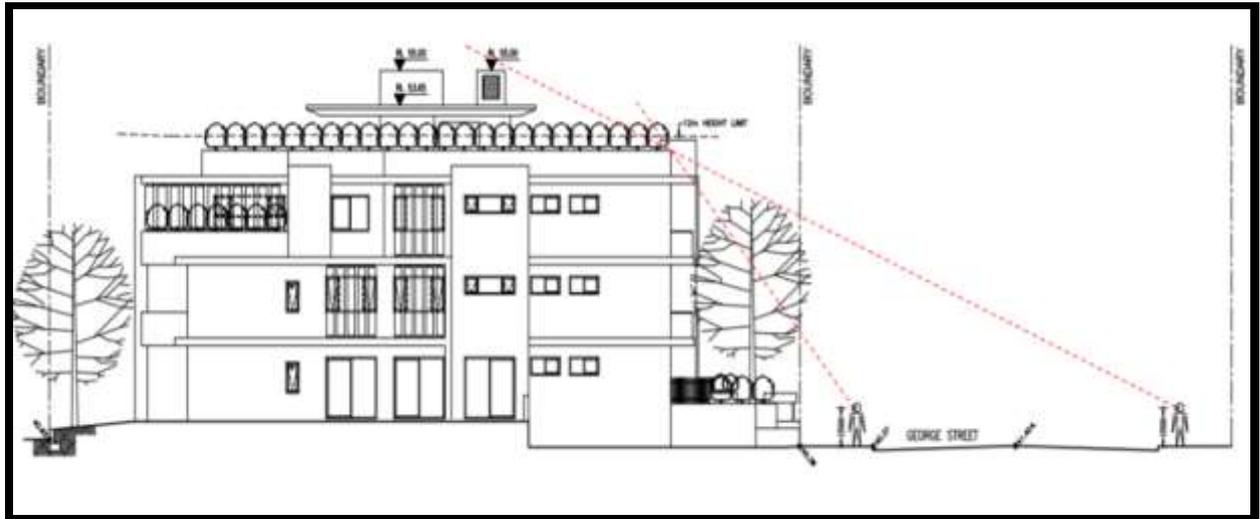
View lines extending along George street to show the visibility of the roof top structures (courtesy: BMA Urban, 2020)
